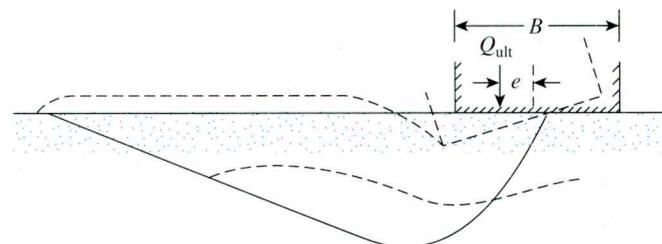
Nature of failure surface in soil supporting a strip foundation subjected to eccentric loading
